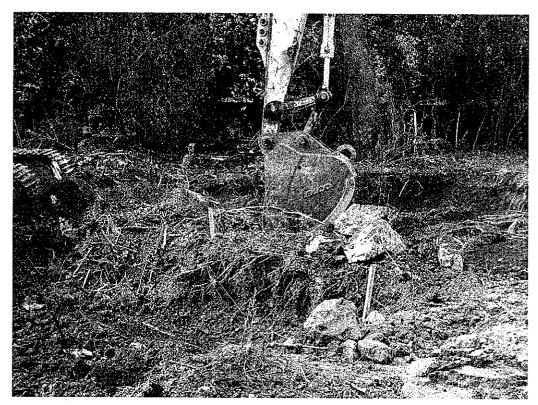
Phase II – Excavation for 48-inch reinforced concrete pipe.
